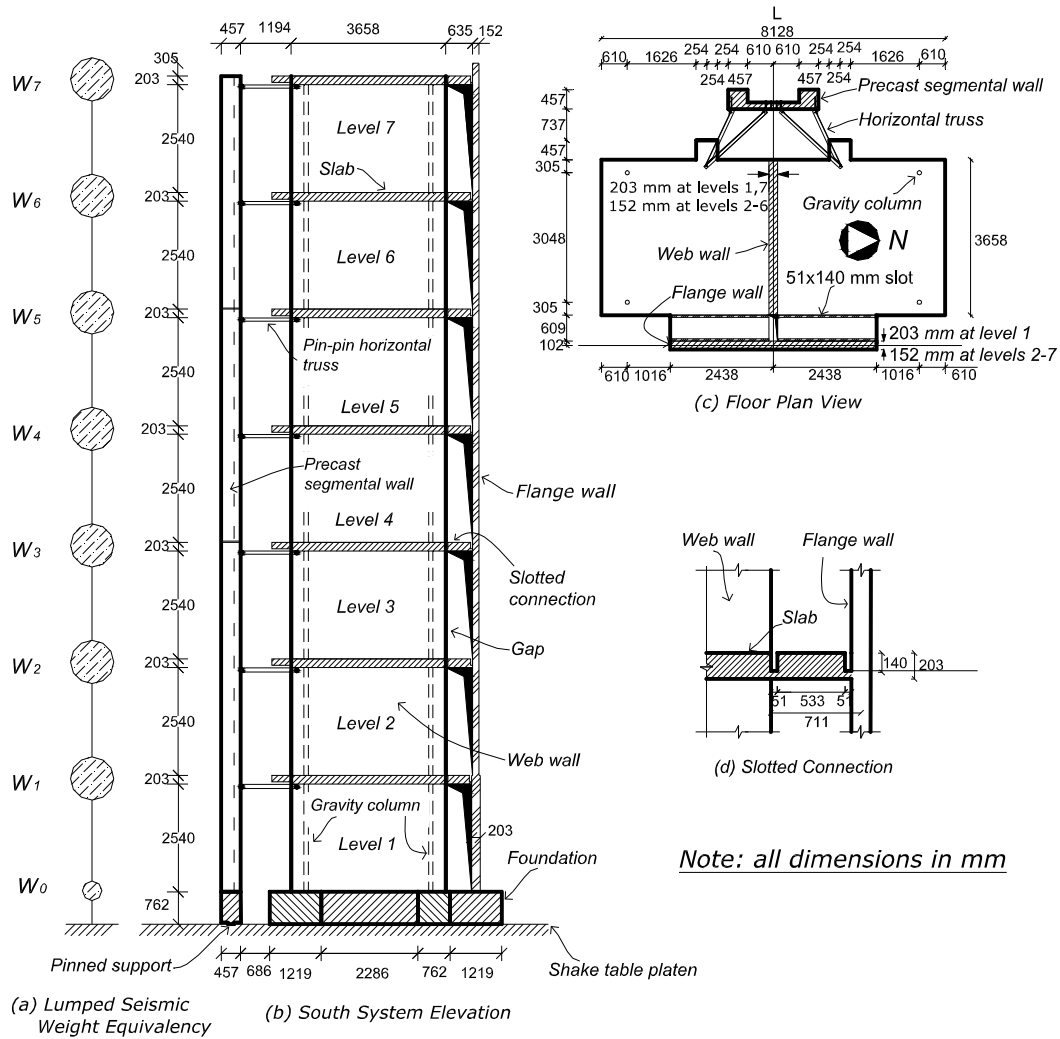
UCSD 7-Story Shake Table Test – Construction drawings
